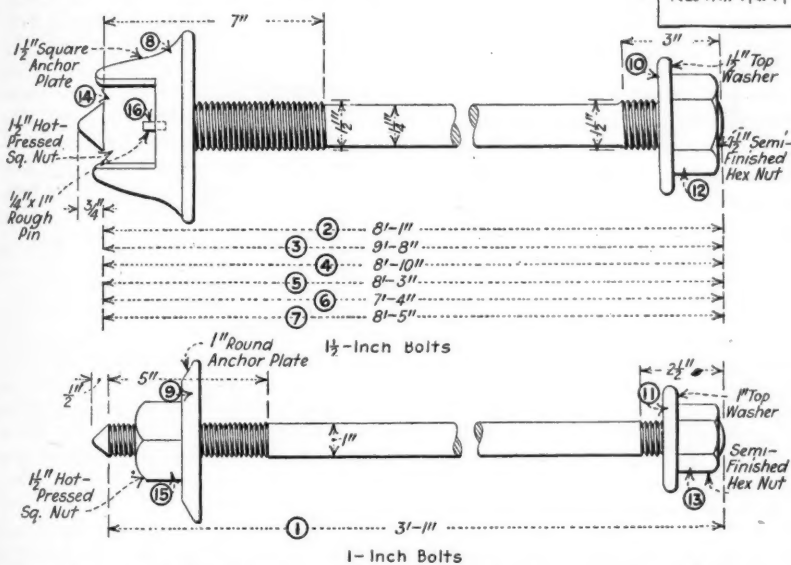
DRAWING SHOWING VARIETIES OF BOLTS, ETC., NEEDED
